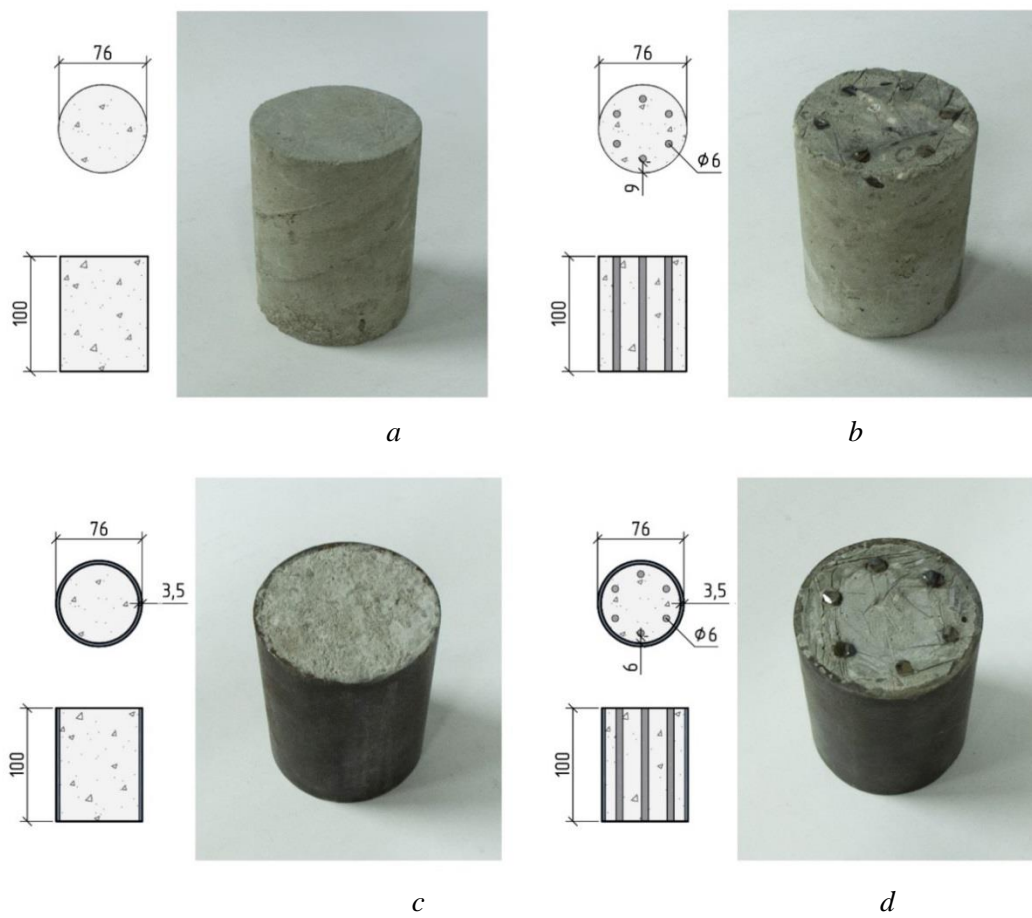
Made specimens: *a* – concrete; *b* – reinforced concrete; *c* – non-reinforced concrete-filled steel tube; *d* – reinforced concrete-filled steel tube
